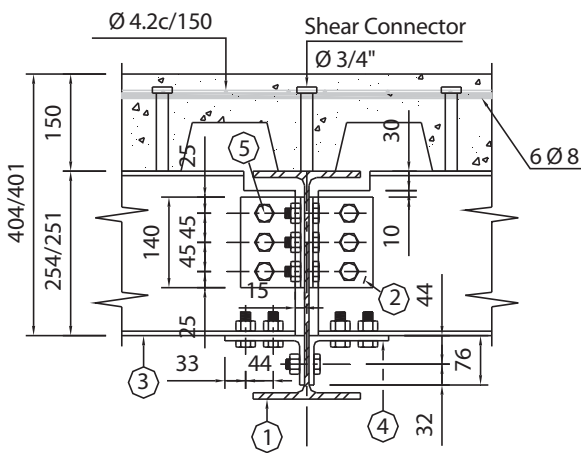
Details of the semi-rigid beam-to-girder connection (dimensions in mm).
